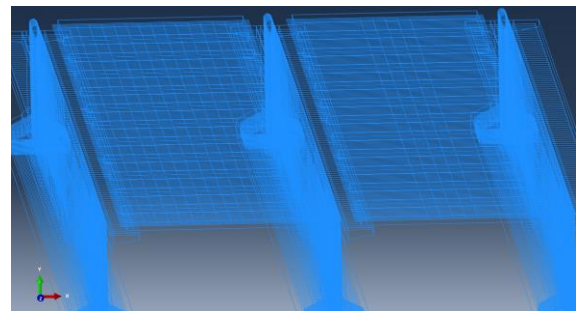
4: Location and placement of typical TxDOT panel for prestressed concrete girders
